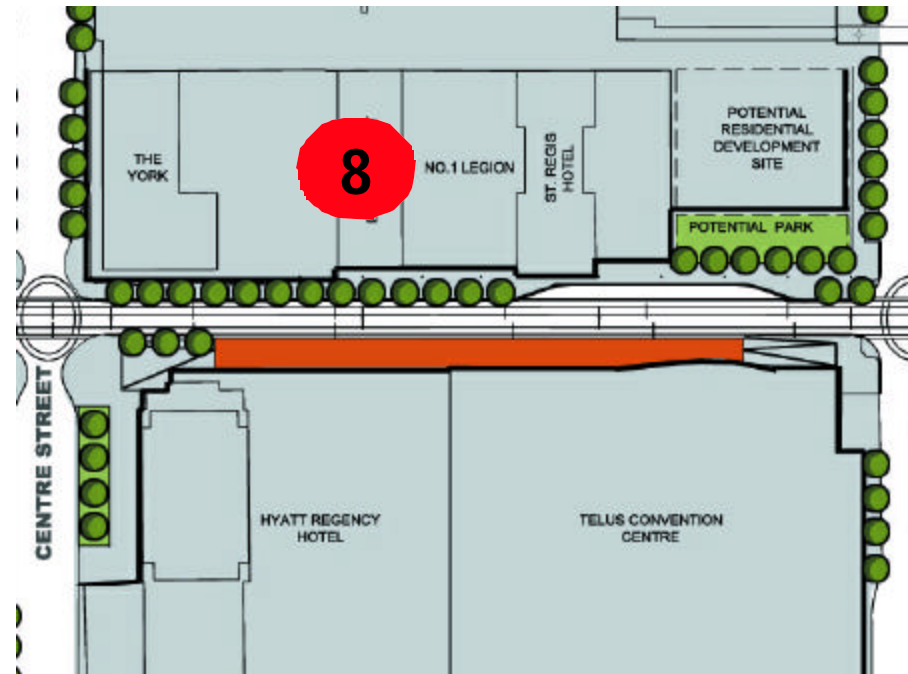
, Site 8 mid block between Centre Street and 1st Street East (Block L)
